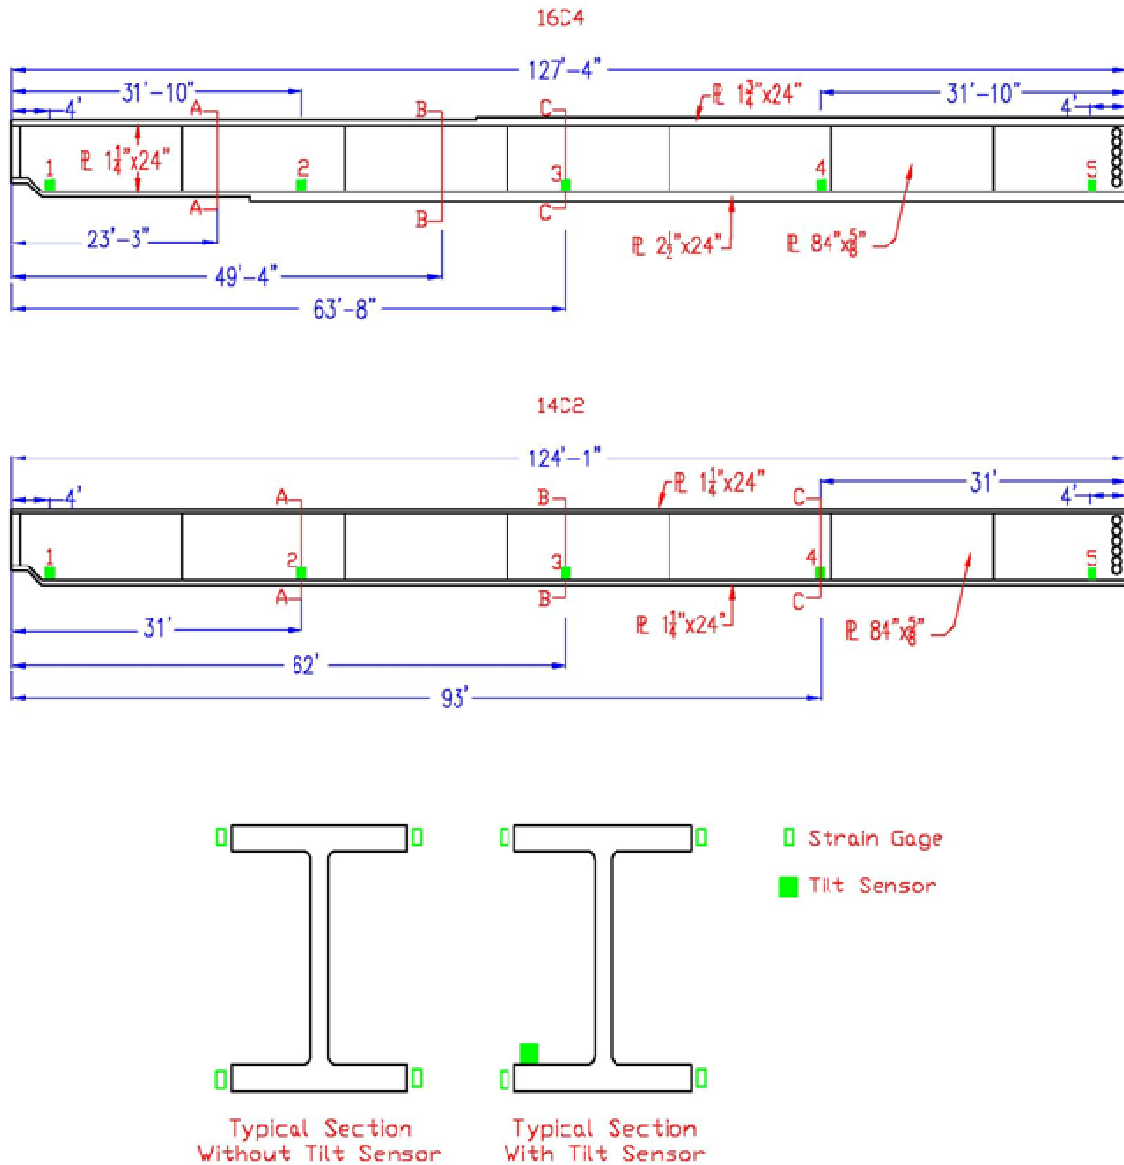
Girder Elevations w/ Gage and Tilt Sensor Locations (Schuh, 2008)
